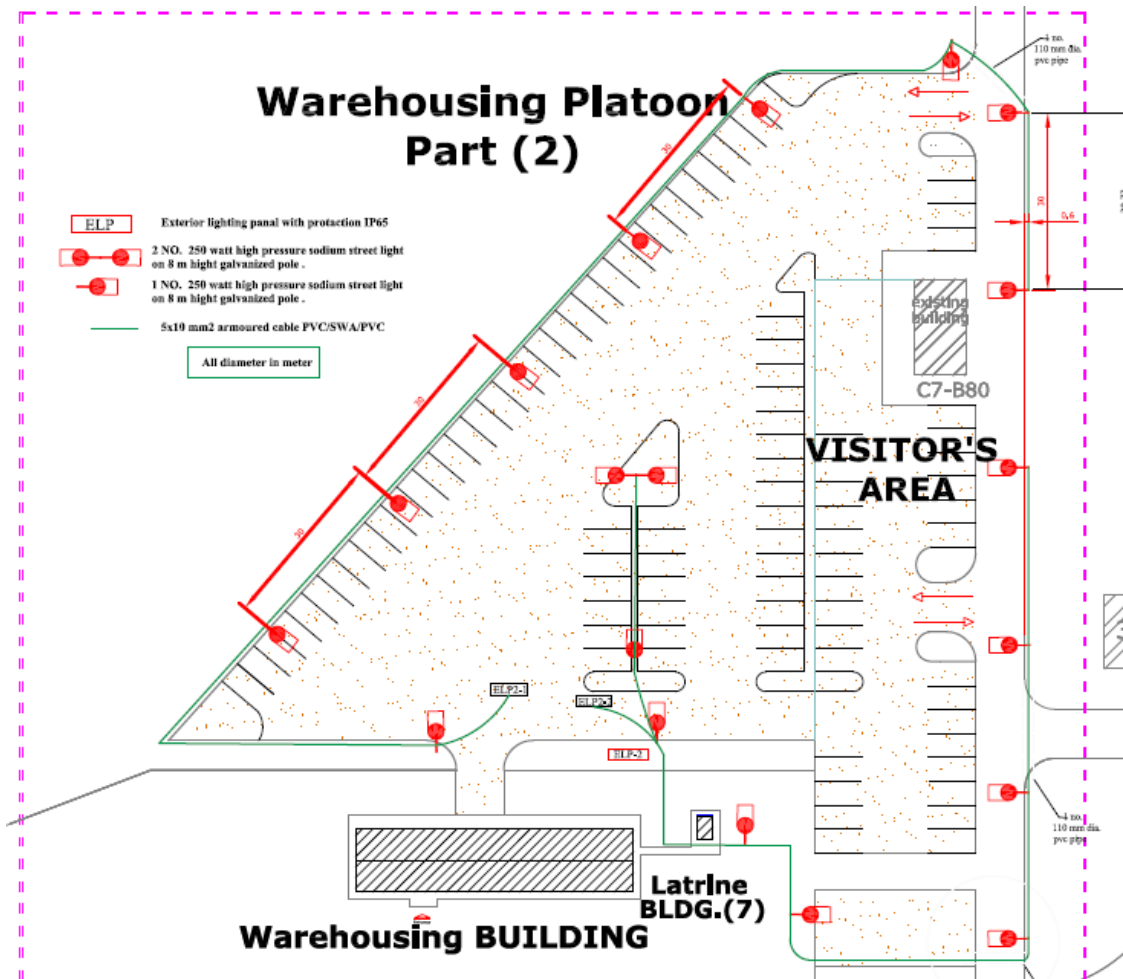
10,000m² parking lot plan (Courtesy of USACE)
